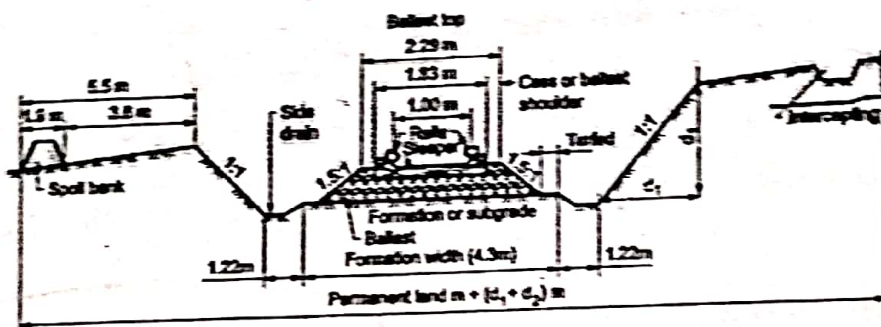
Cross-section of a single meter gauge track in cutting
